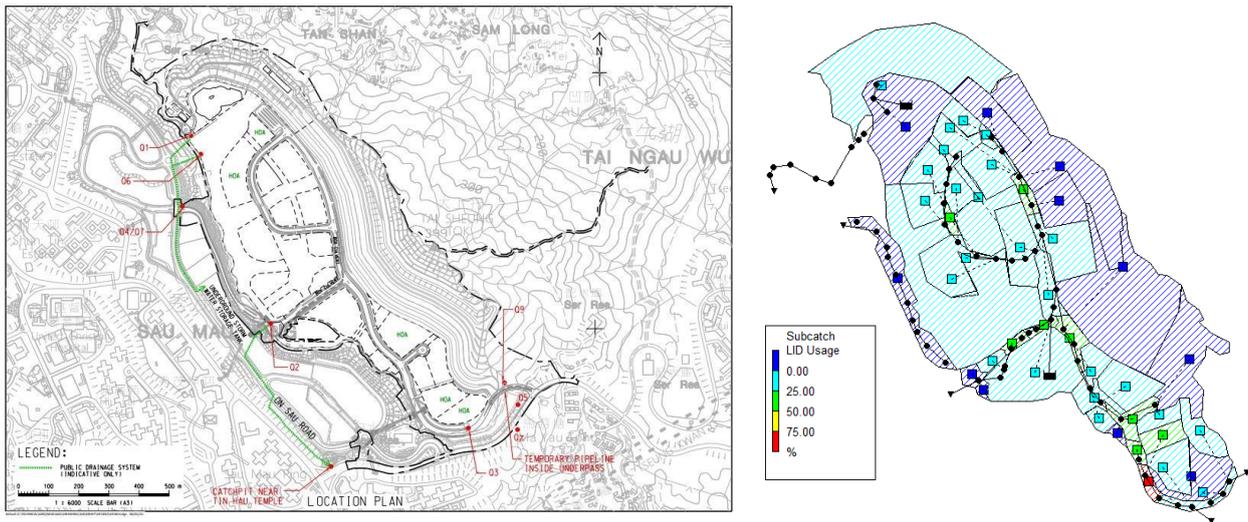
left: Layout plan of temporary drainage outlets of ARQ Site (2020); right: LID usages of subcatchments in SWMM model
